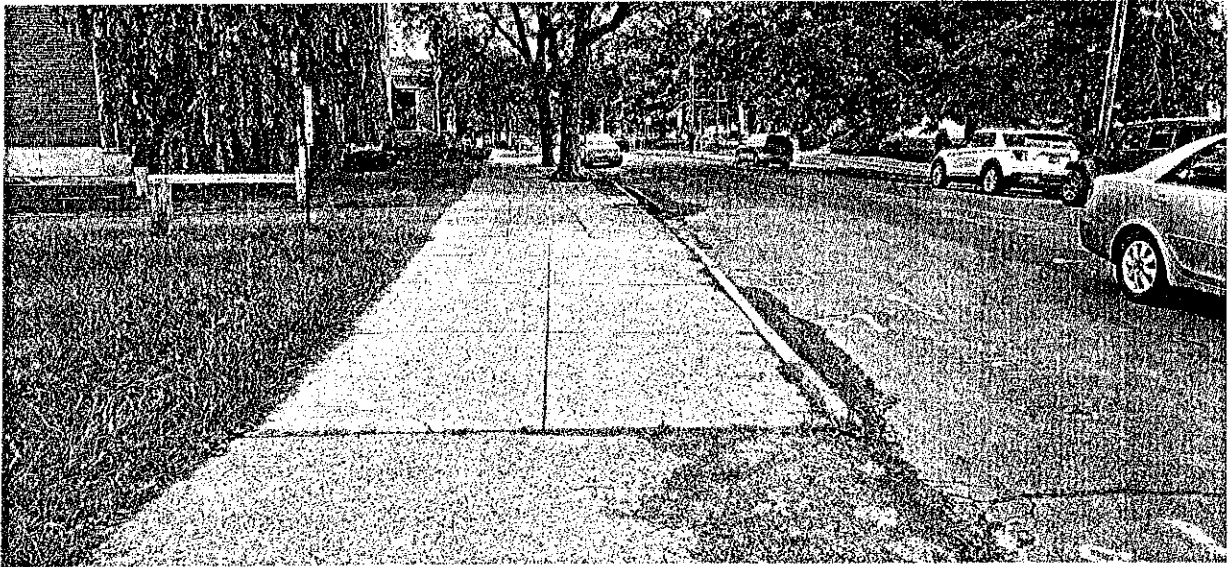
Spalling concrete sidewalk and heaving sidewalk at trees.
